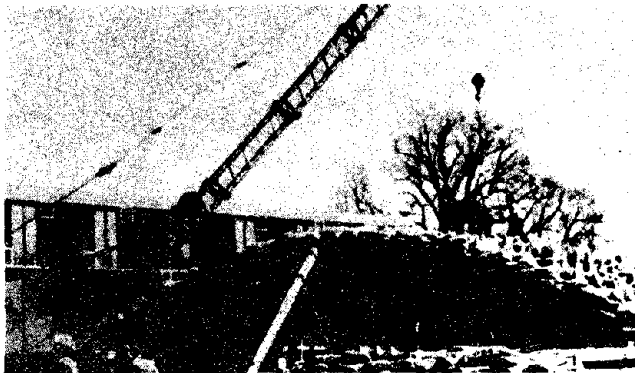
Loading on Segmental Latticed Roof Trusses of 60-Ft. (18.29 m) Span.
